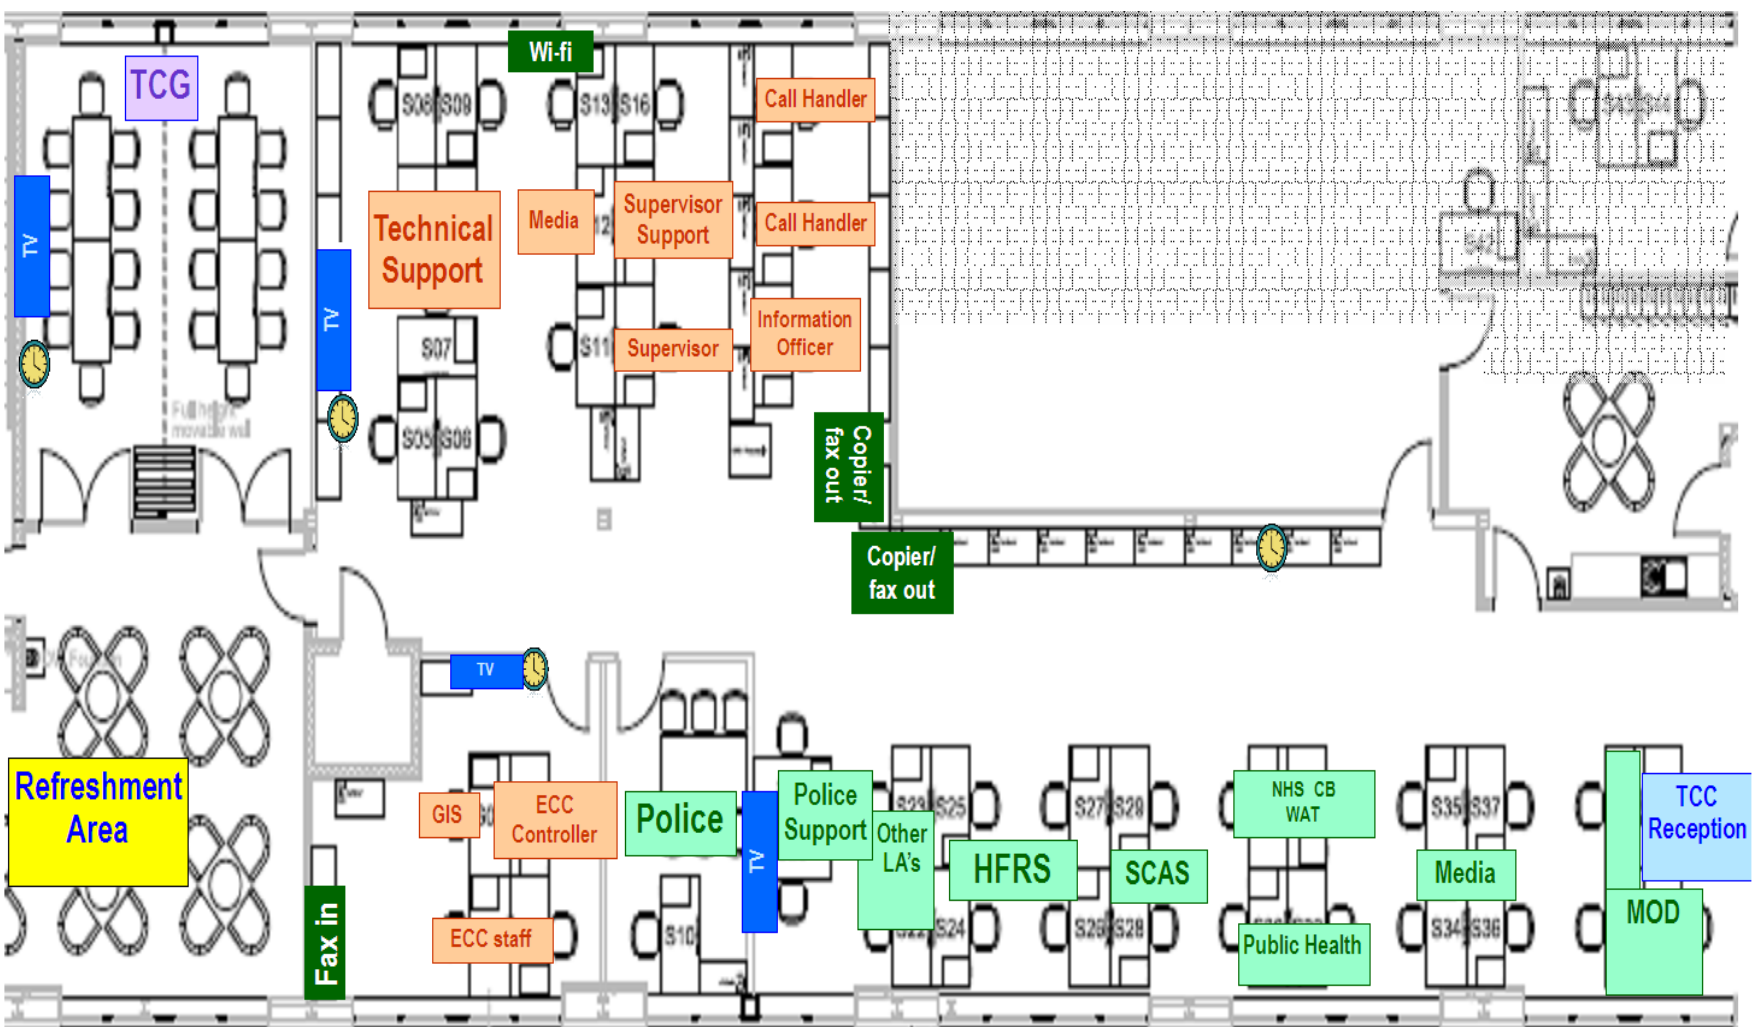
Tactical Command Centre – City Depot – Floor Plan
